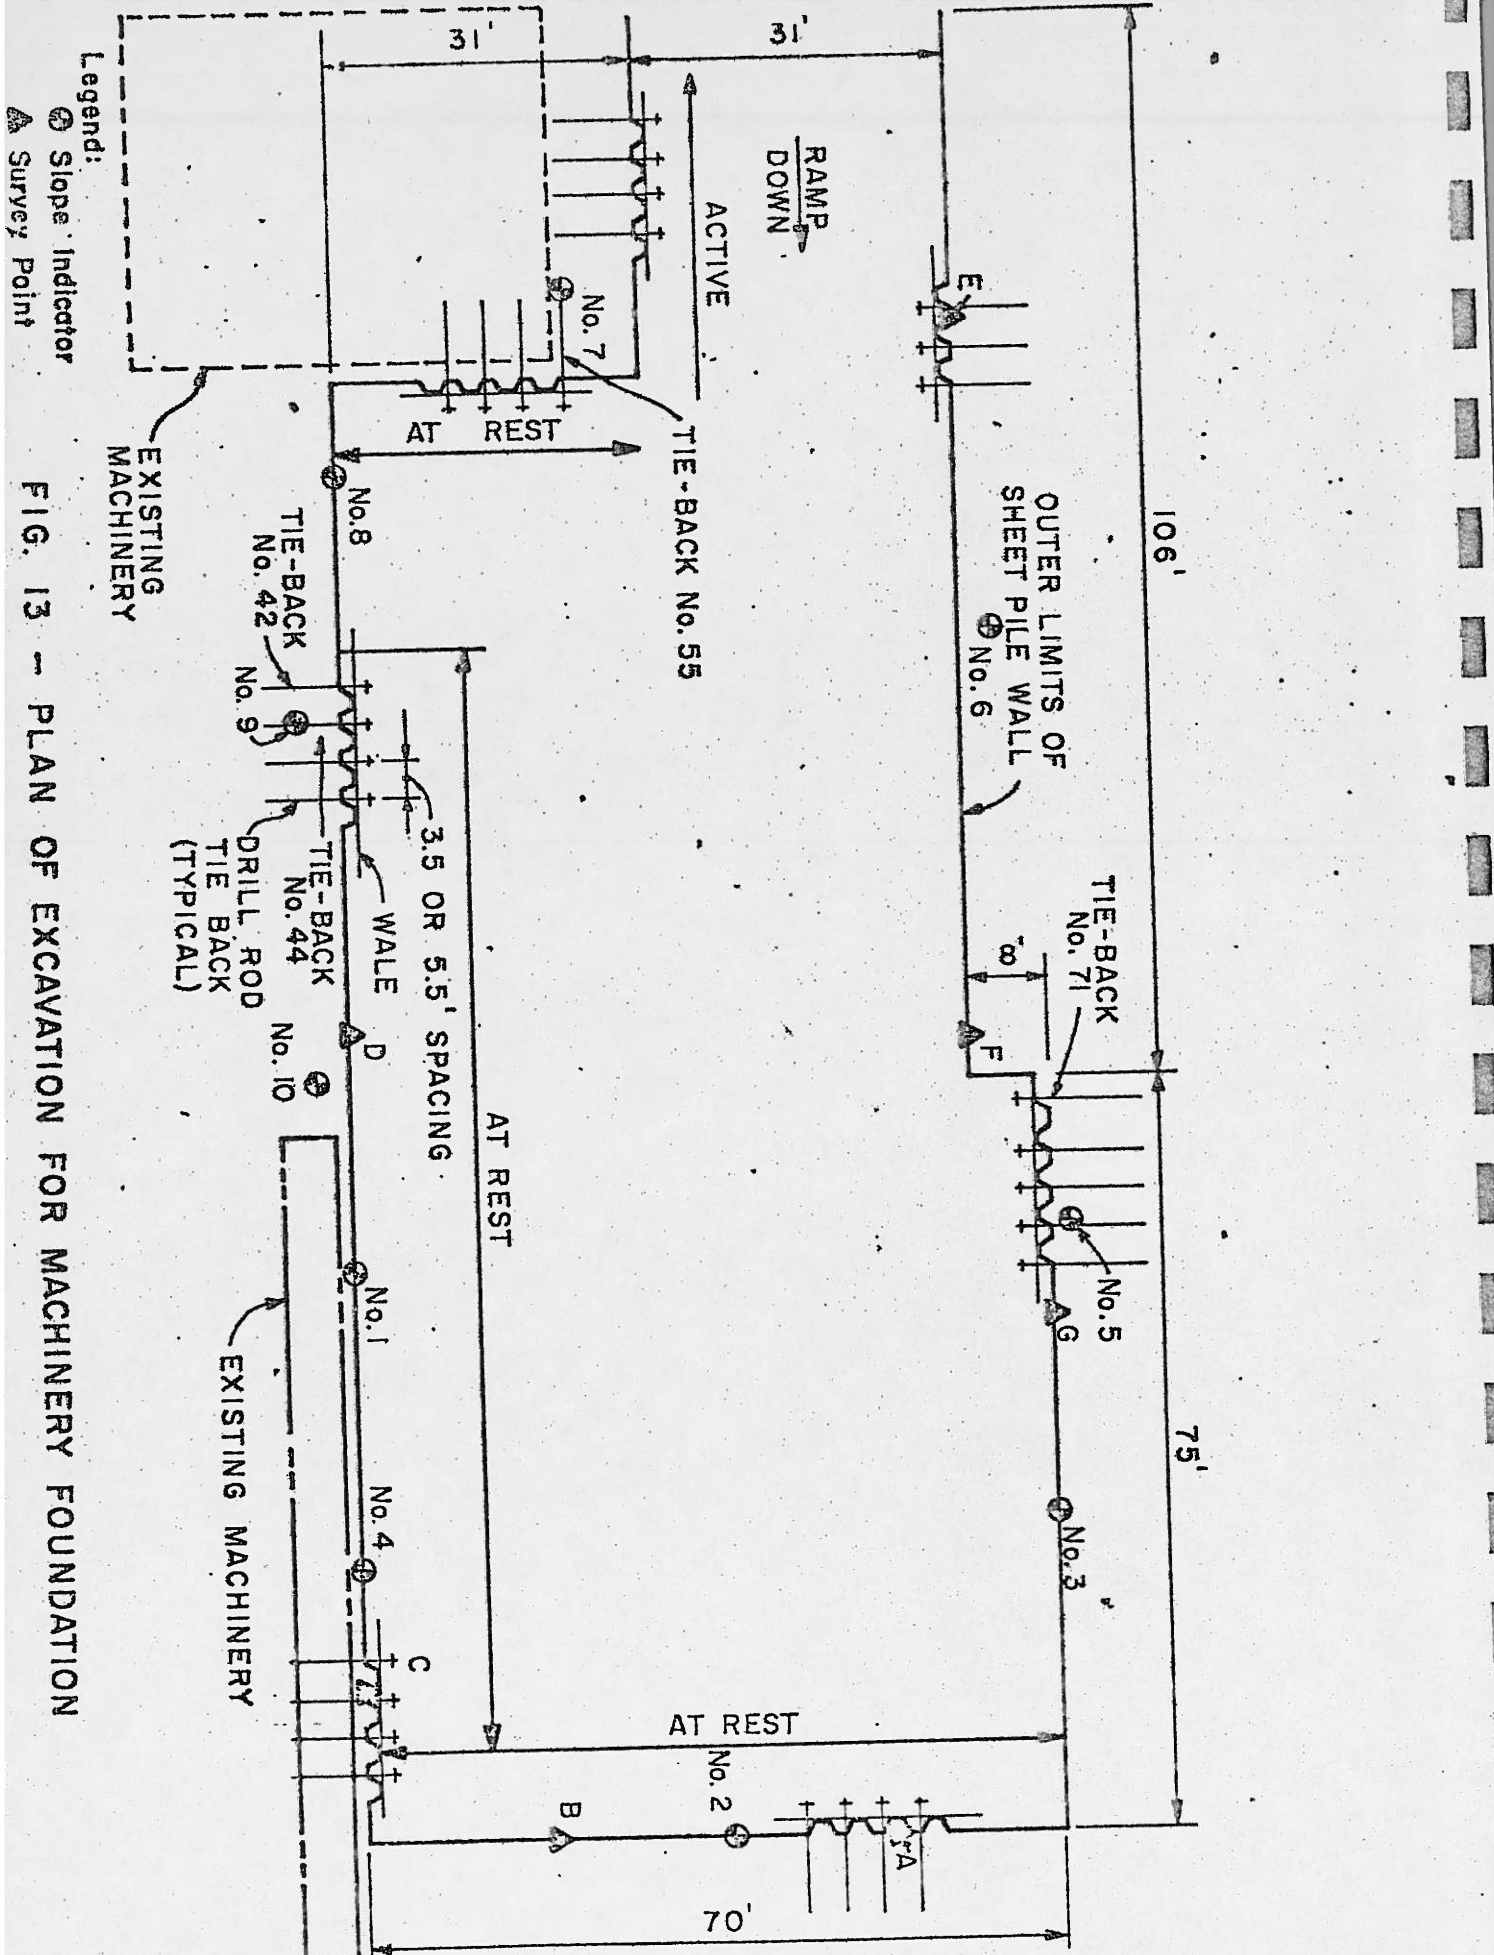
PLAN OF EXCAVATION FOR MACHINERY FOUNDATION
